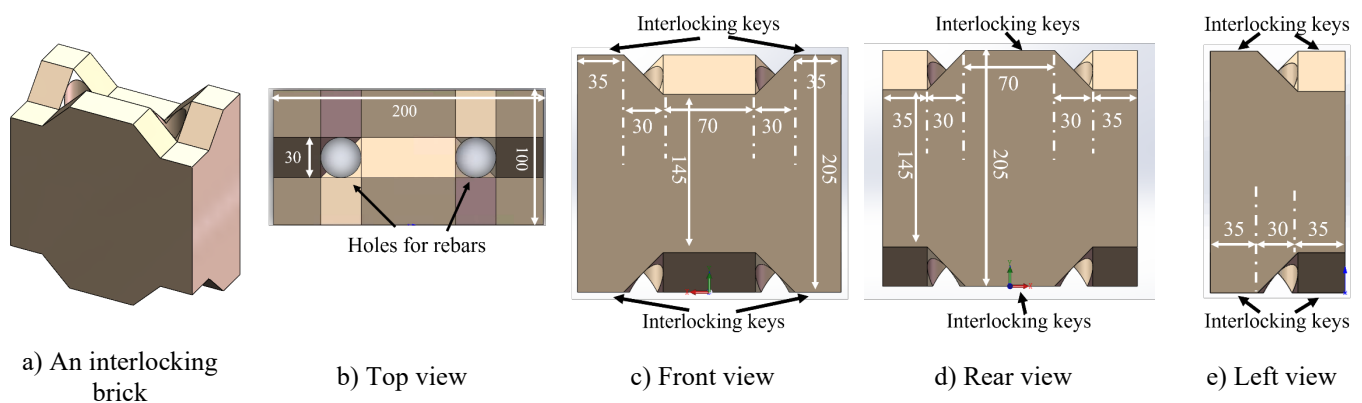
Geometry and dimension of the full-scale interlocking bricks (unit: mm)
